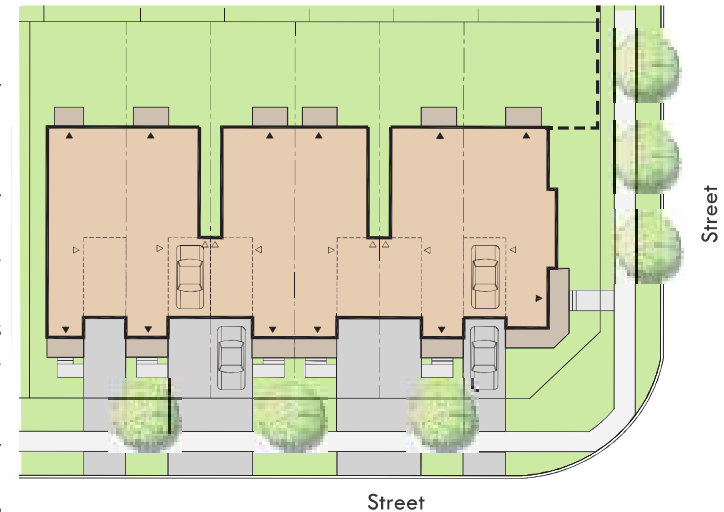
Conceptual Siting of Street Townhouses
